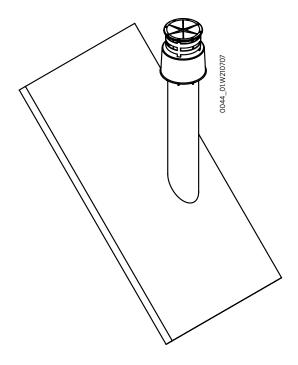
Waste gas vertical outlet chimney set and Pitched Roof Outlet Tile part installation for Roof
